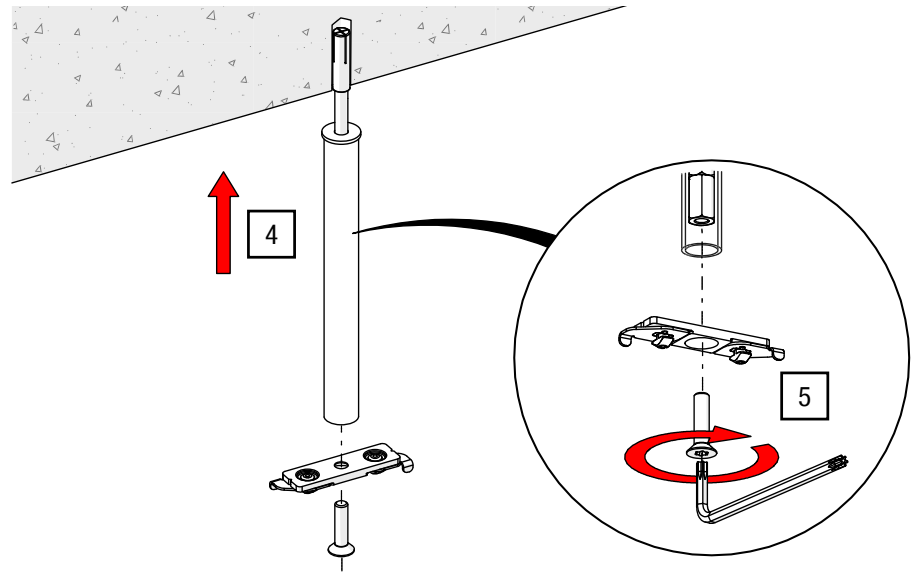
Ceiling suspension – Ceiling mount bracket to suspension
